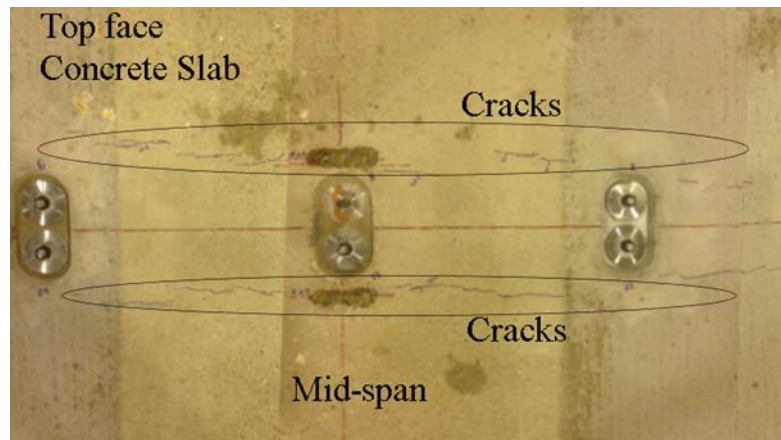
Longitudinal cracks in concrete slab
